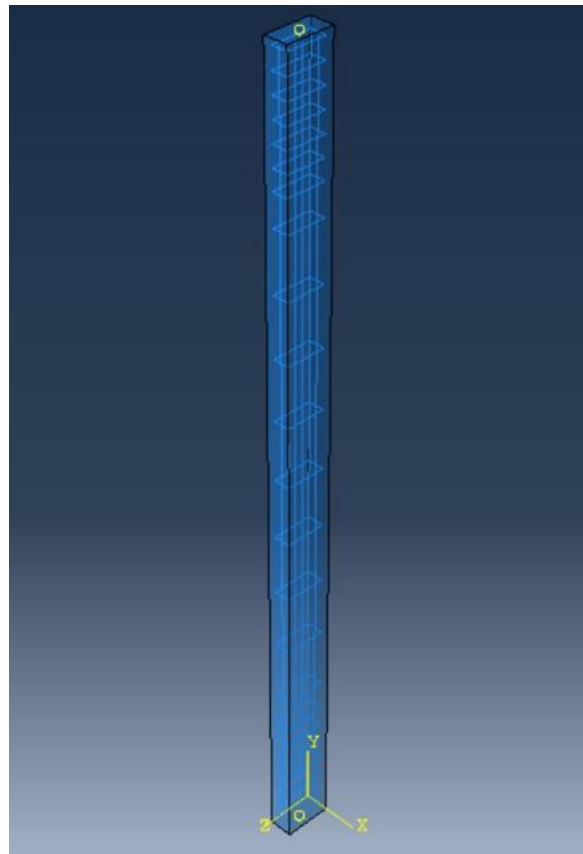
Assembly Module of Slender RC Column Specimen.
